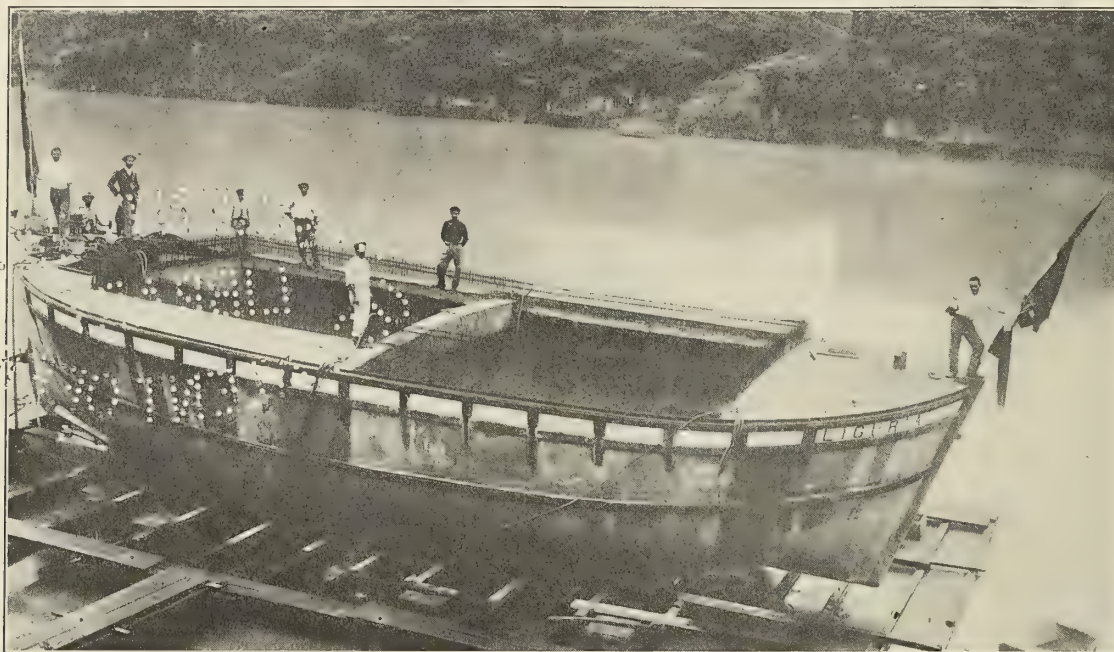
BARGE UNDER CONSTRUCTION, SHOWING REINFORCEMENT AND ATHWARTSHIP GIRDERS.
